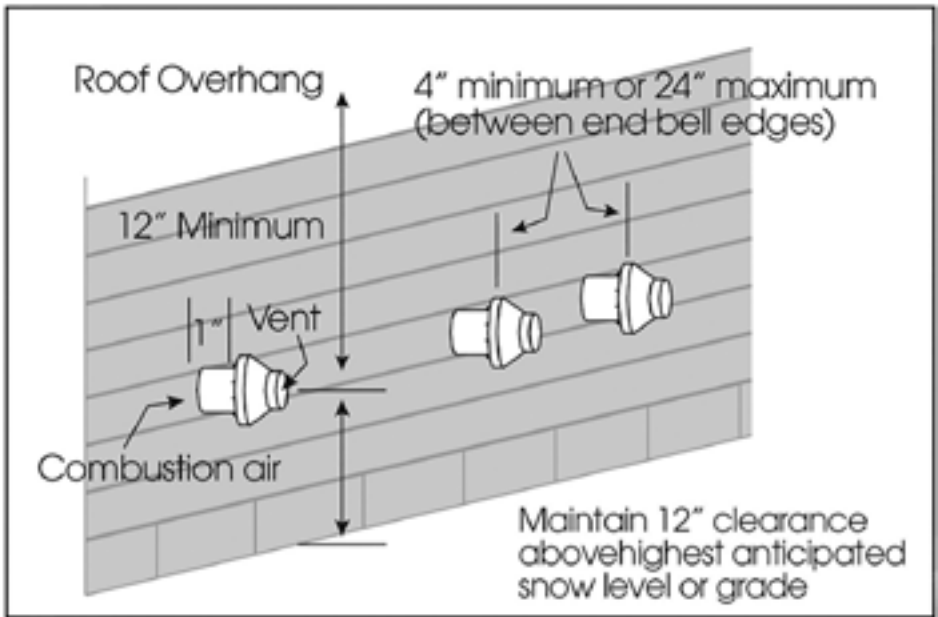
Sidewall Termination for Multiple Concentric Vents (Horizontal)
